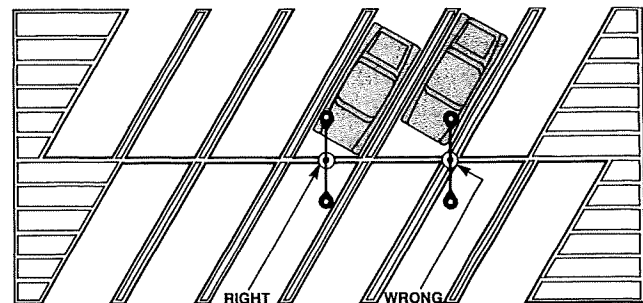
Light standards (poles) should be located on center lines of stall end boundaries
